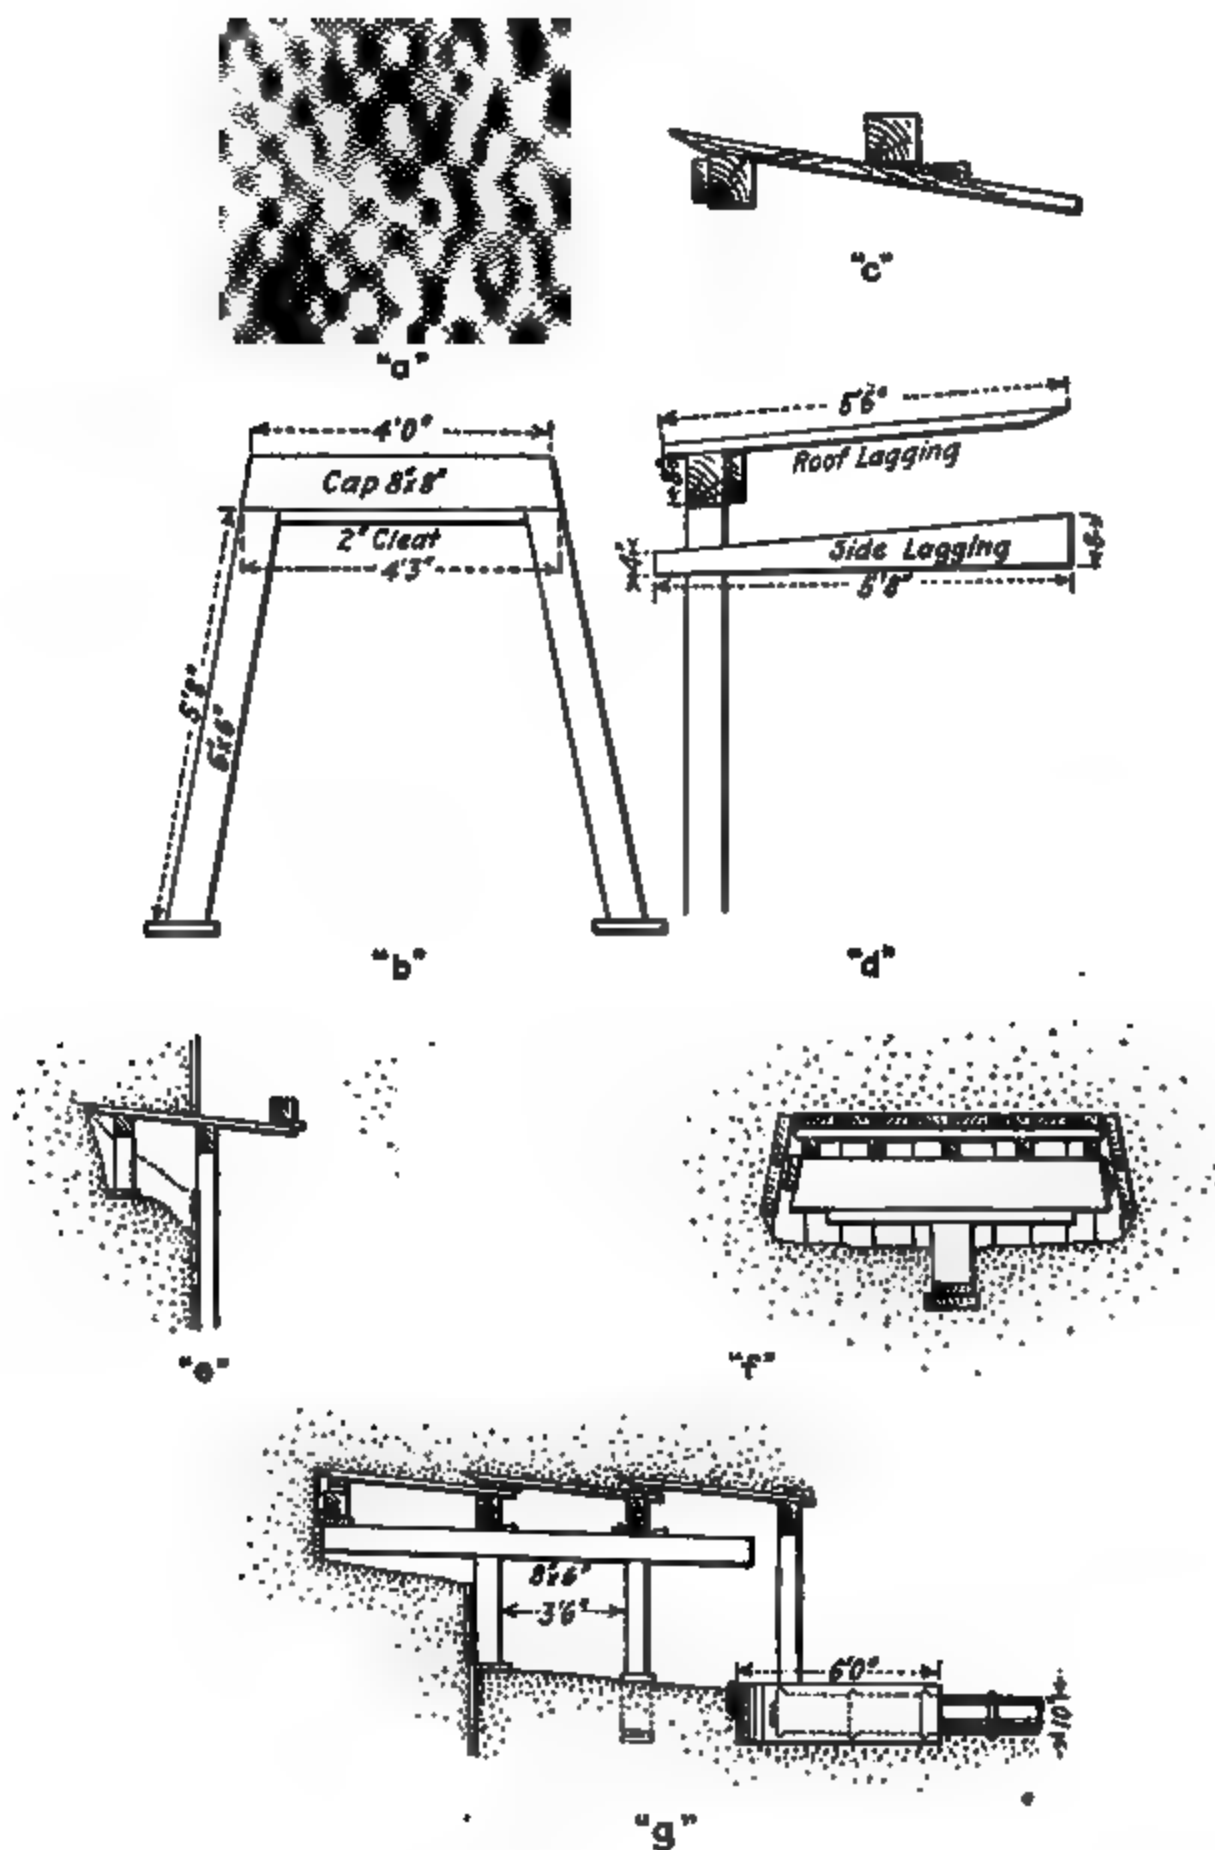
Method of timbering tunnel through fine, wet sand, Newton, Mass.
